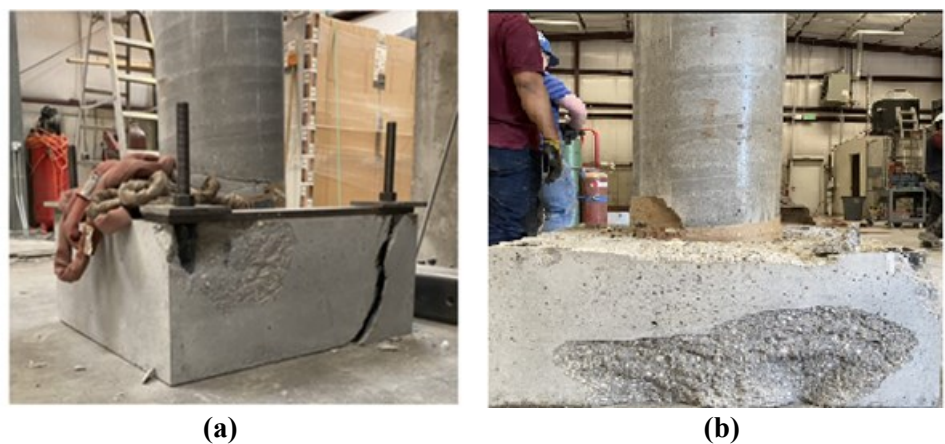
Post impact damage of (a) Pier 1; (b) Pier 2.
